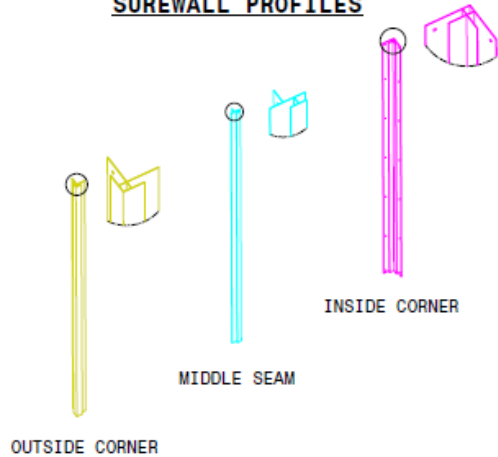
SUREWALLS DRYWALL SYSTEM—OUTSIDE CORNER PROFILE (3019)
